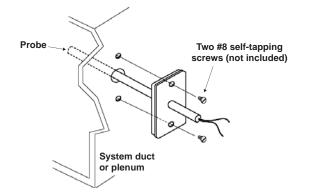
Installing the TE-701-A or TE-701-B Sensor
